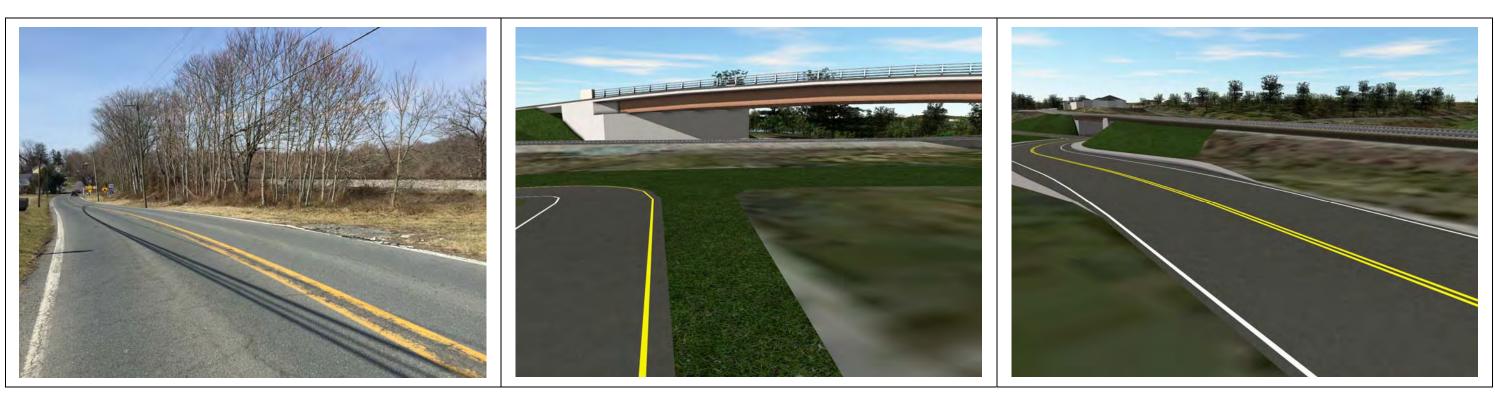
View from near 14920 Clopper Road. Left: Site photo looking west. Middle: Alternative 1 highway bridge, looking north. Right: Alternative 2 rail bridge, looking west.
